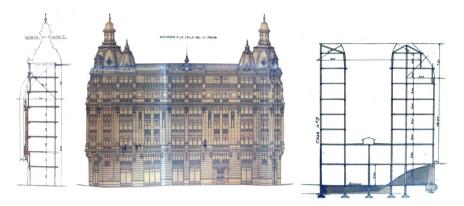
Original plans of a residential building with reinforced concrete structure (1920),
